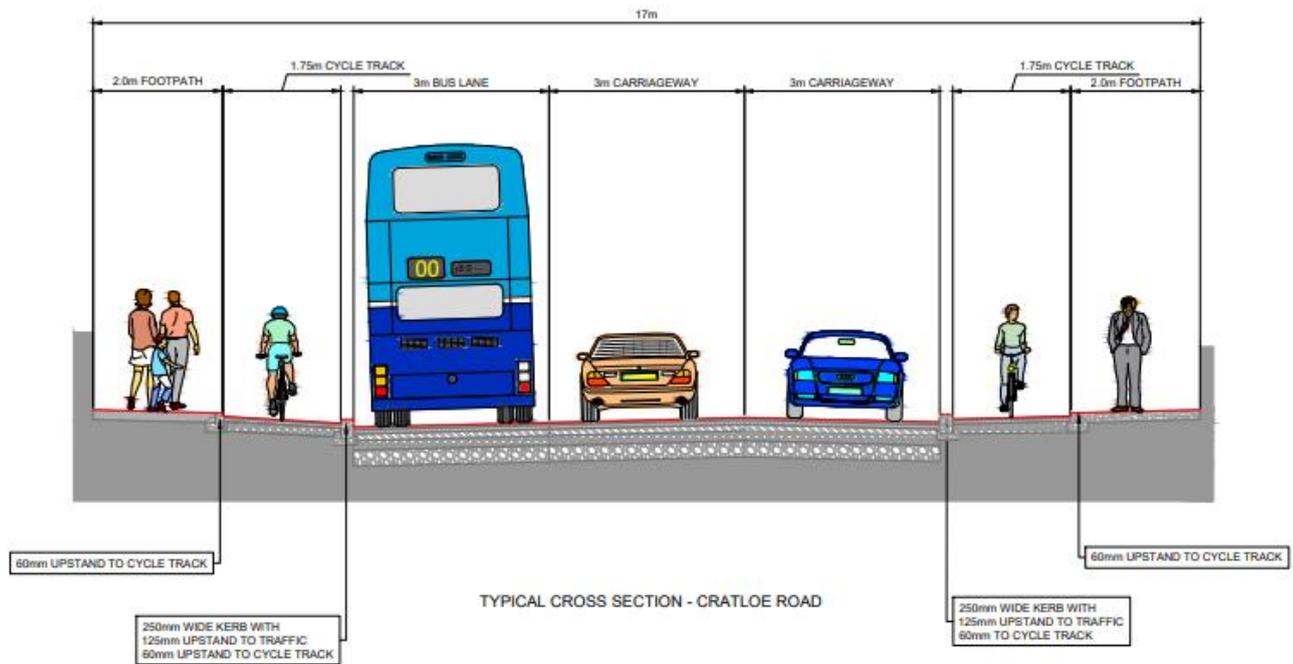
Typical Cross Section on Cratloe Road showing proposed footpath, cycle and road carriageway arrangements.
